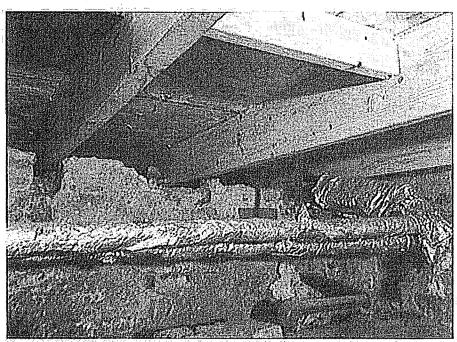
New floor joists not bearing on foundation wall, supported by rim joist.
